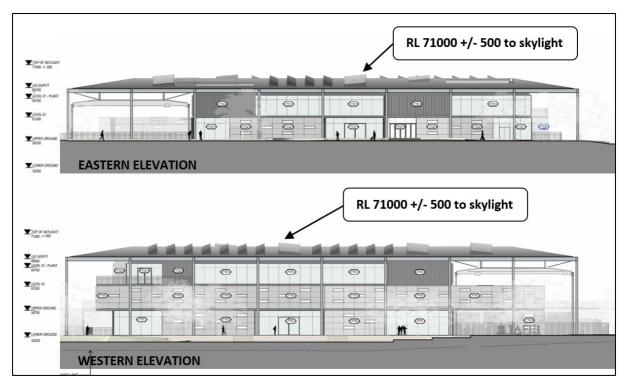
| Eastern (top) and Western (bottom) elevations of the IATC Building (Source: Applicant's RtS)
